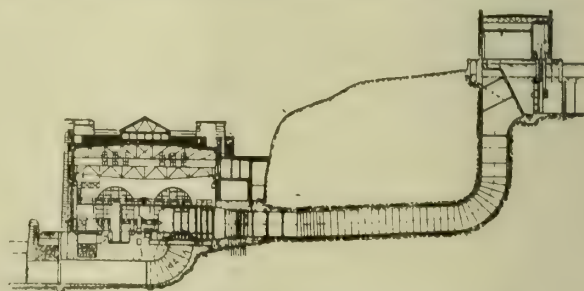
Section through Power Station and Intake Building, Trollhättan. Diam. of penstock 13 ft. 6 in.
